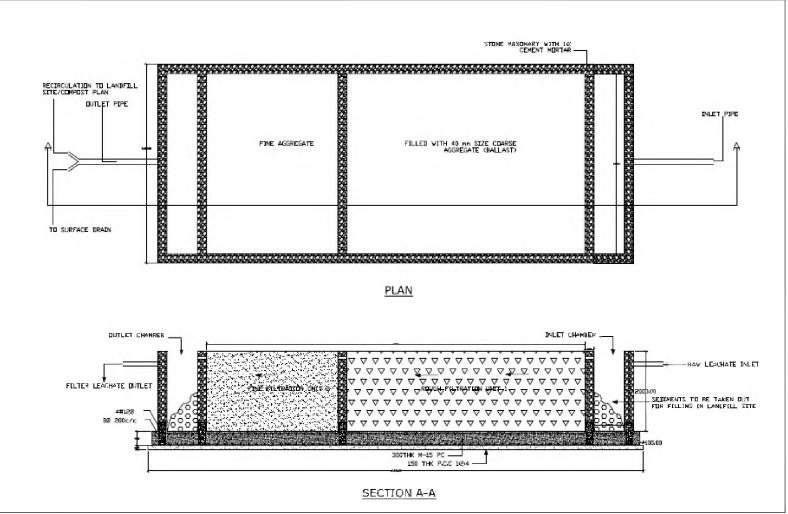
PLAN AND SECTION OF LEACHATE TREATMENT RCC TANK
